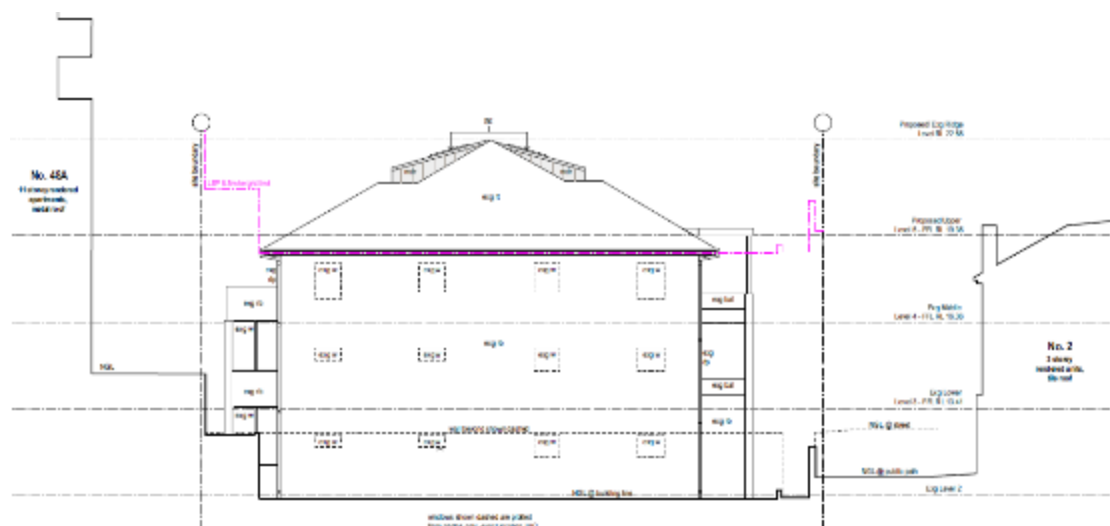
Plan extract northern elevation showing minor intrusion into view plane.
